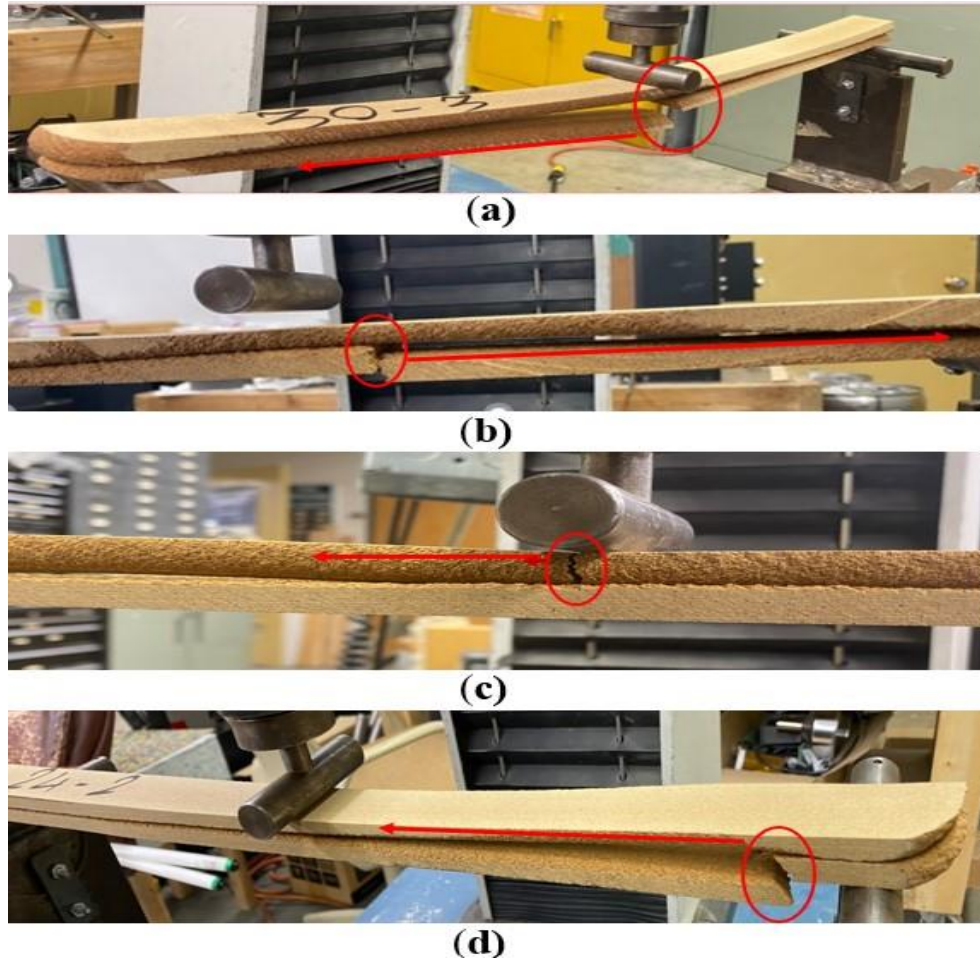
Delamination failure modes of two-layer beams under flexural tests at span at higher span-to-height proportions (24 and 30).
